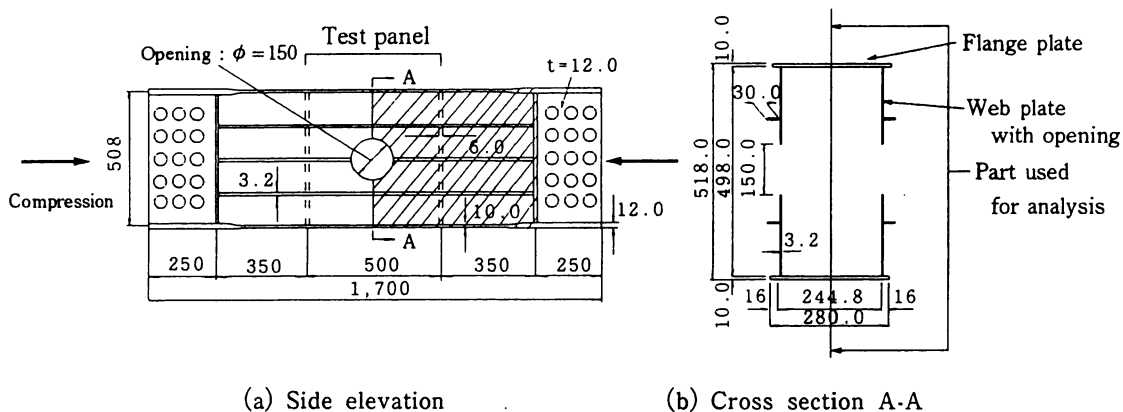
Side elevation and cross section of test model No.2 (dimensions in mm)
